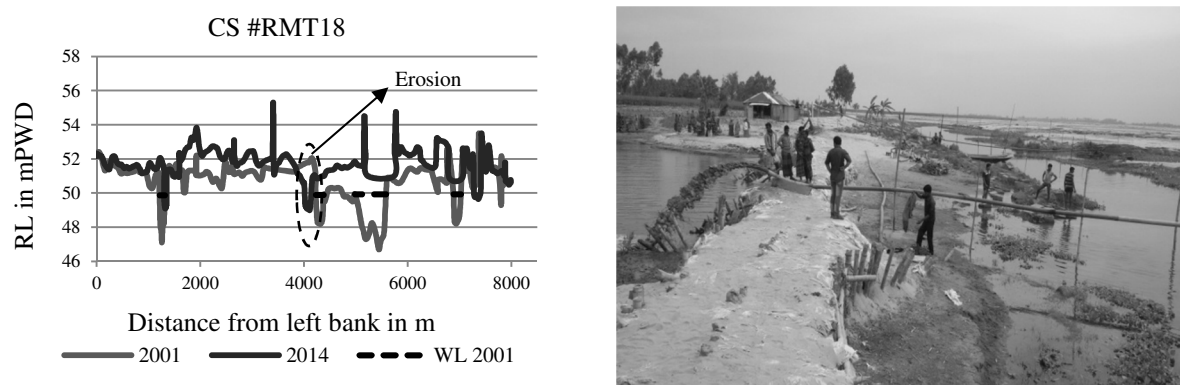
(left) Superimposed cross section at RMT 18 and (right) site condition at left bank of the section (Guddimari union, Hatibandhaupazila) of river Teesta.
